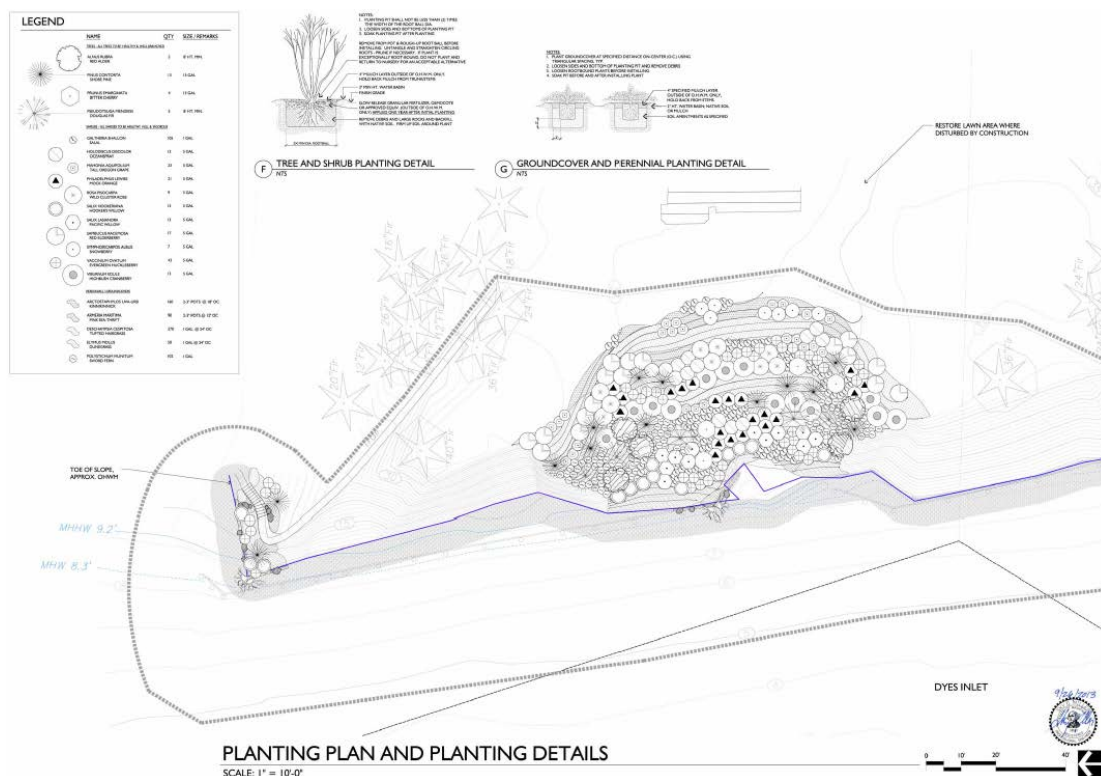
PROPOSED PLANTING PLAN FOR BULKHEAD REMOVAL PROJECT. MAJORITY OF PLANTING IS IN GRADED AREA.
